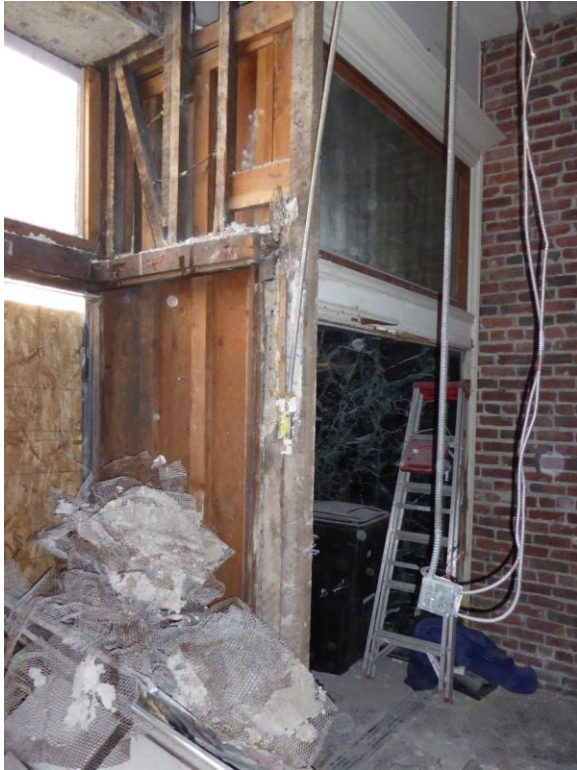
Interior view of 353 Kearny entrance, looking southeast. Note entry vestibule with wood and glass transom above double-door opening (photograph taken on 04/02/2018).
